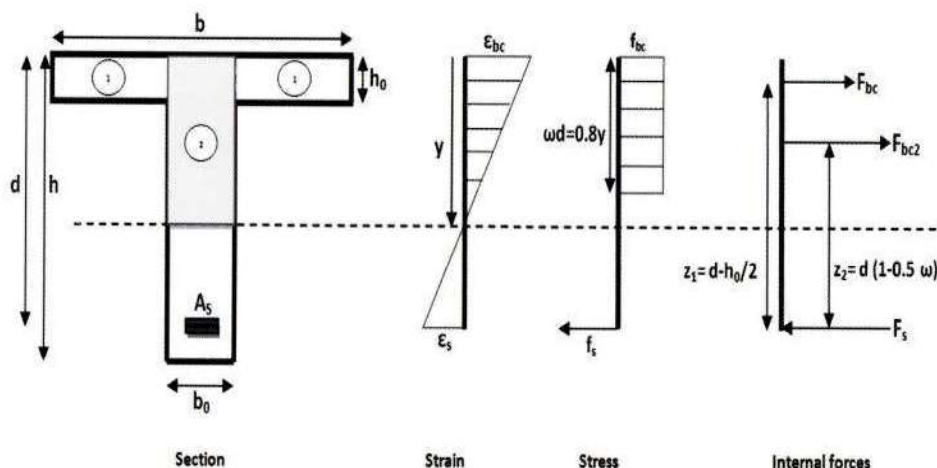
Typical T-Cross section, strain, stress and internal force distributions under ultimate design load.
